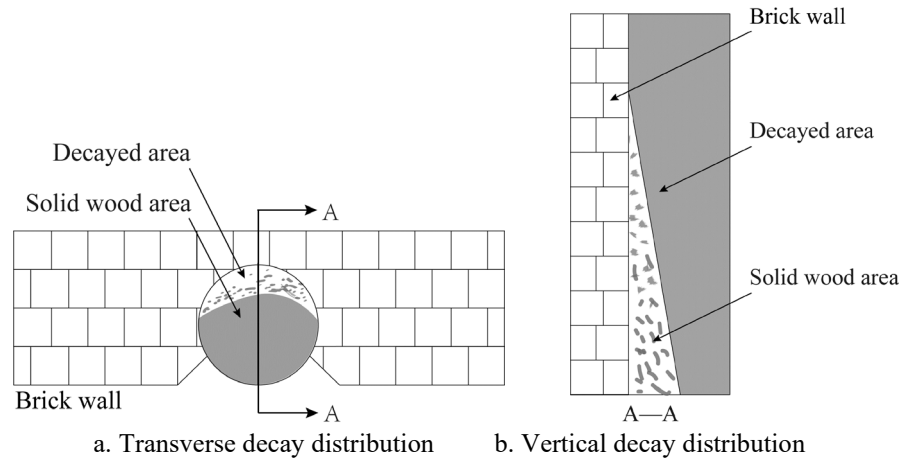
Schematic diagram of decay law of a single-sided exposed wood column
